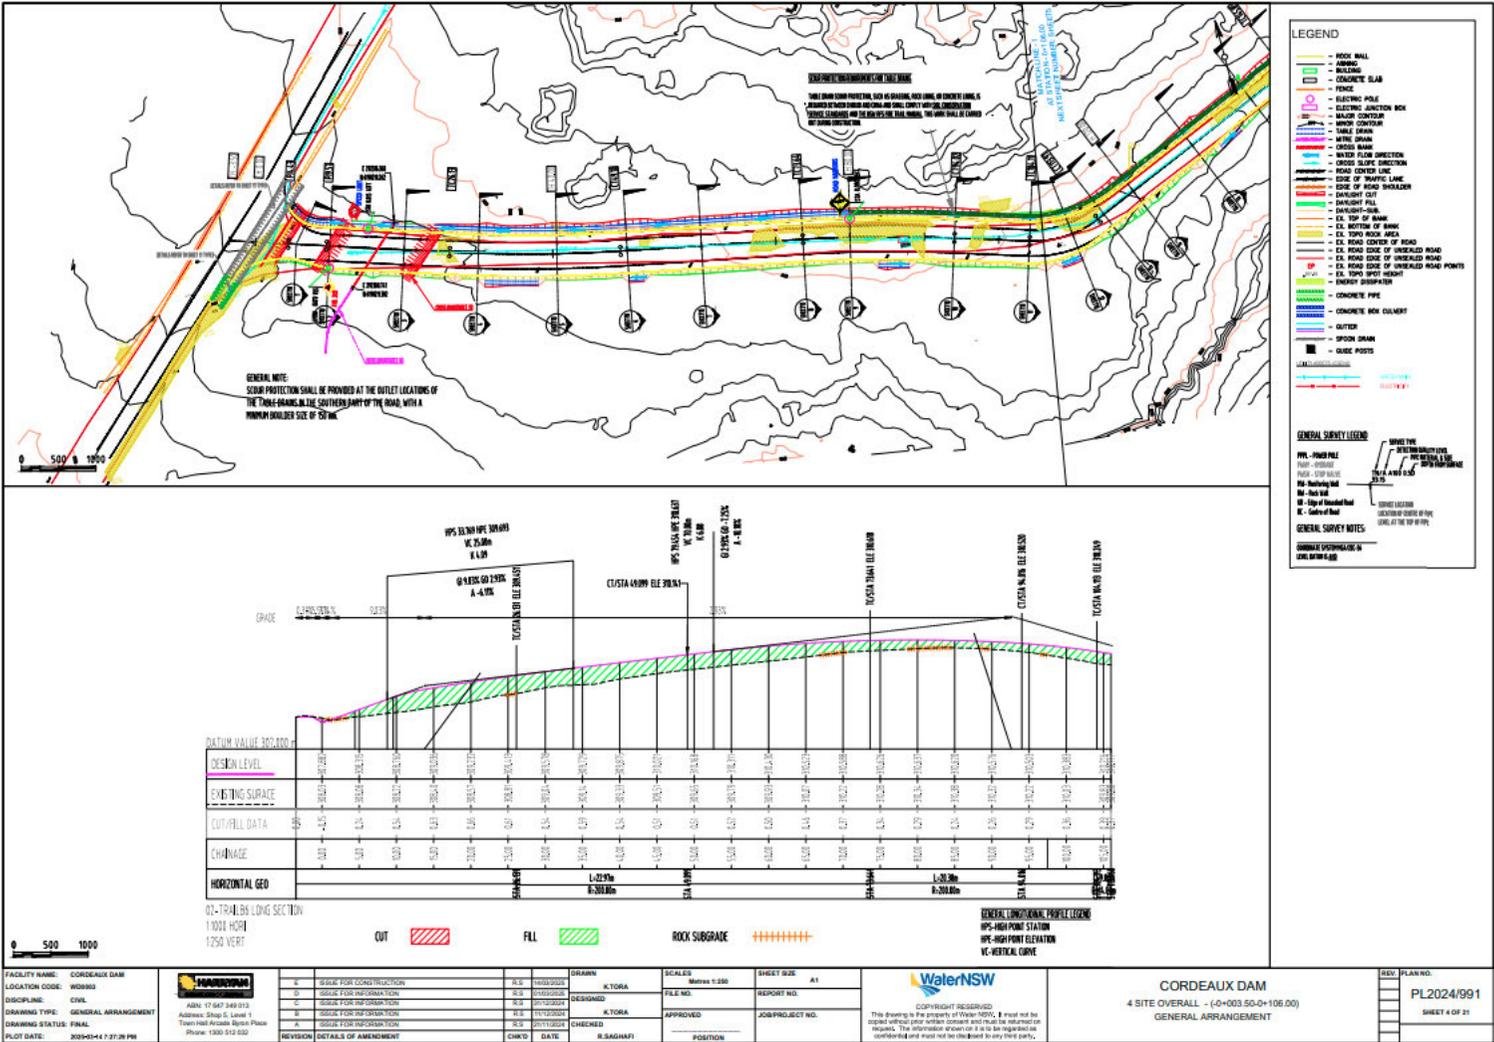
Scour protection details and road signage for Area 2, southern part of Trail B6 (Source: Cordeaux Dam Construction Drawings, Water NSW)
